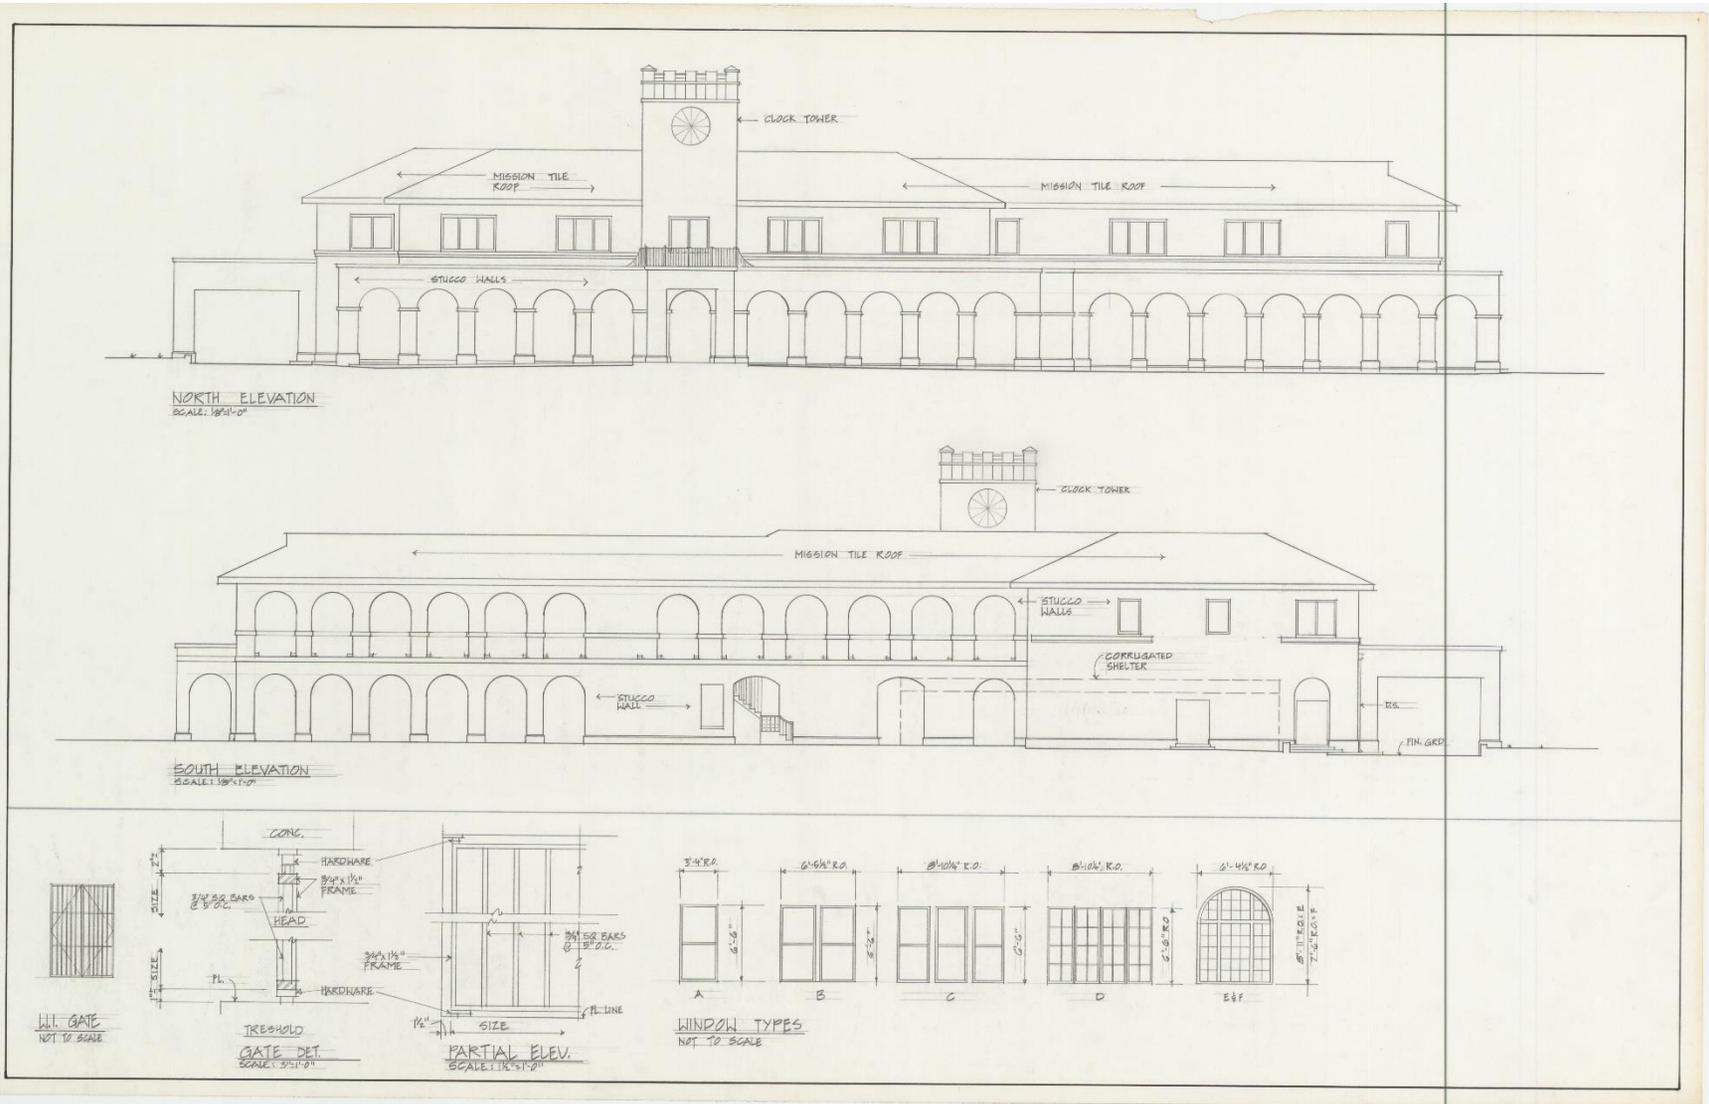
Tracing of 1975 existing condition elevation drawing. Courtesy Hawaiian Railway Society.
